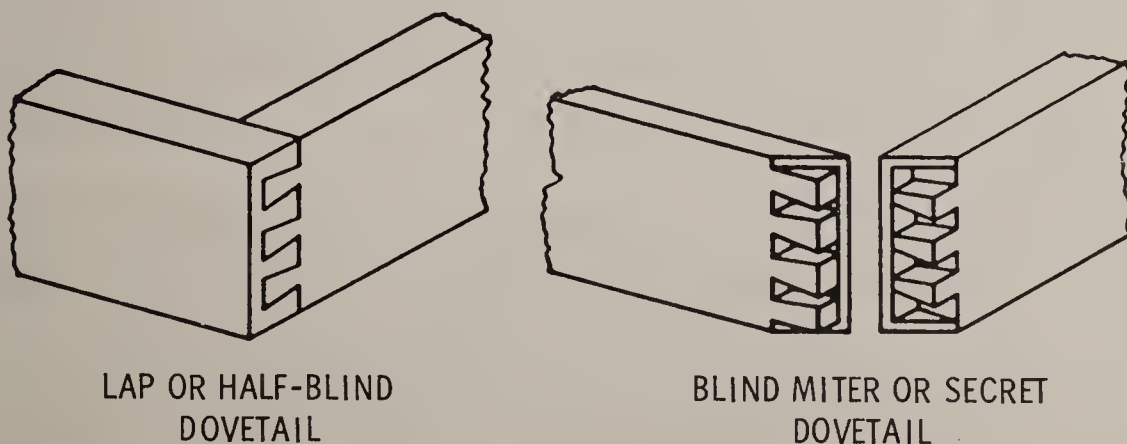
Half-blind dovetail joints respectively. The half-blind dovetail joints are used in the best grades of drawer and cabinetwork. The joint is visible on one side and not on the other. It should be exceptionally well fitted because of the frequent pull on the front piece.
